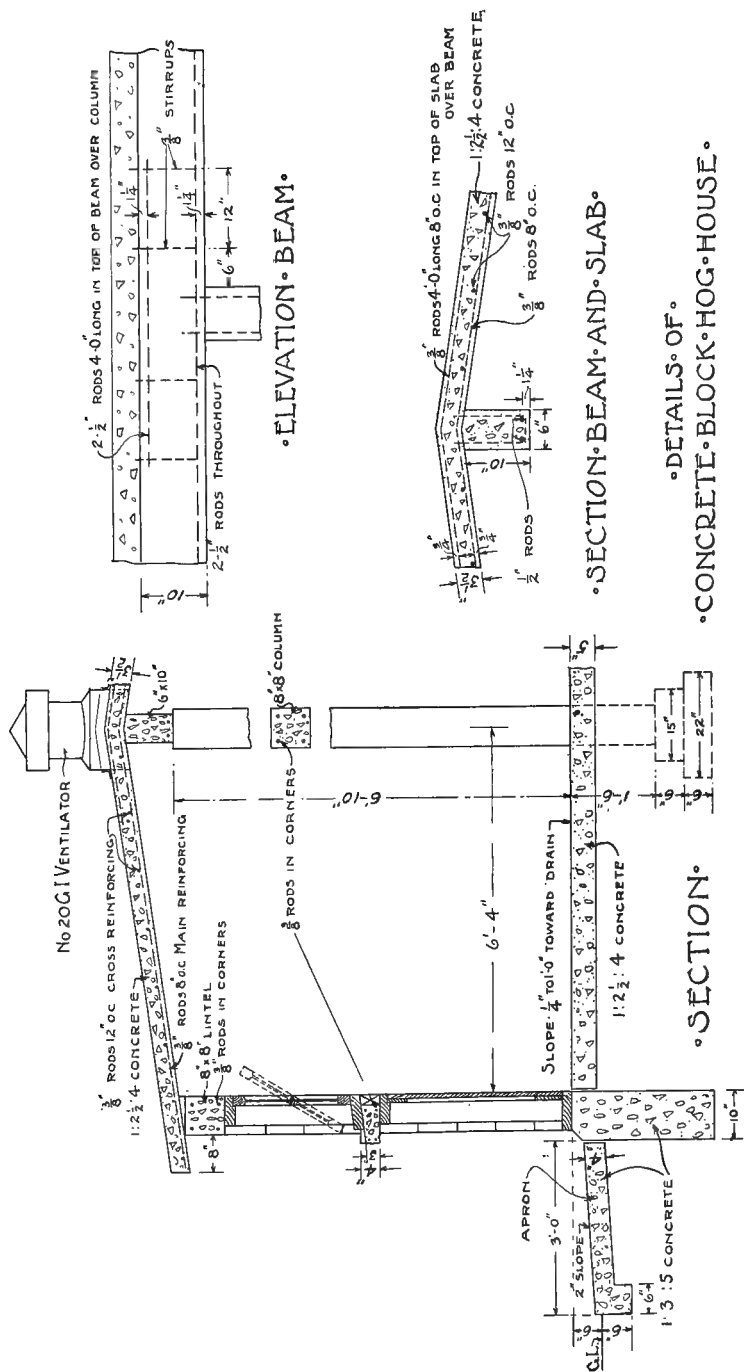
Detailed Sectional Views, Five Pen Hog House of Concrete Blocks.
